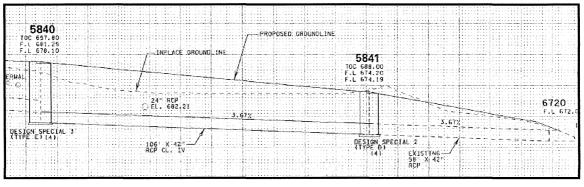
PRE-CONSTRUCTION PROFILE OF STORM SEWER 5840 TO 5841
